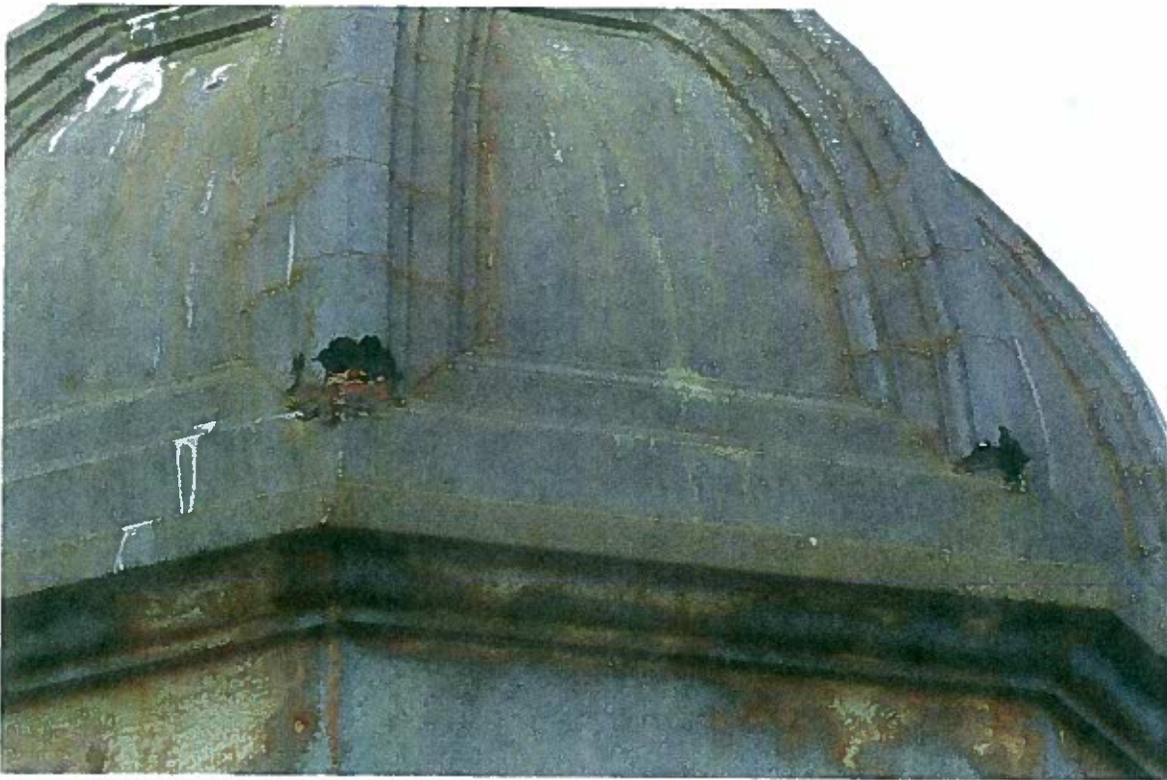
Detail of corrosion at chimney/roof top ventilator cap.
